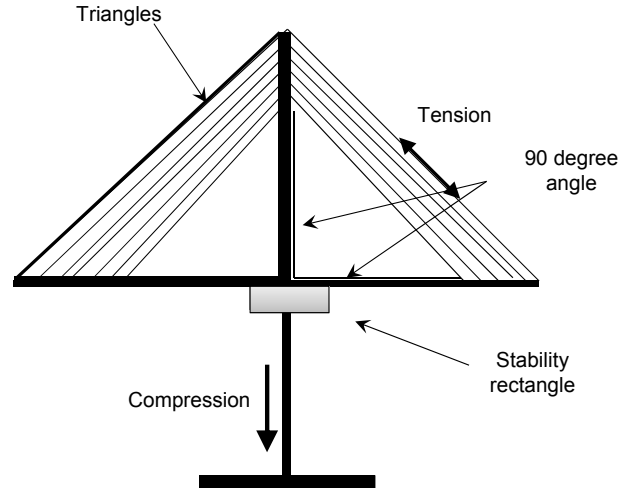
A simple illustration of typical cable-stayed bridge.
